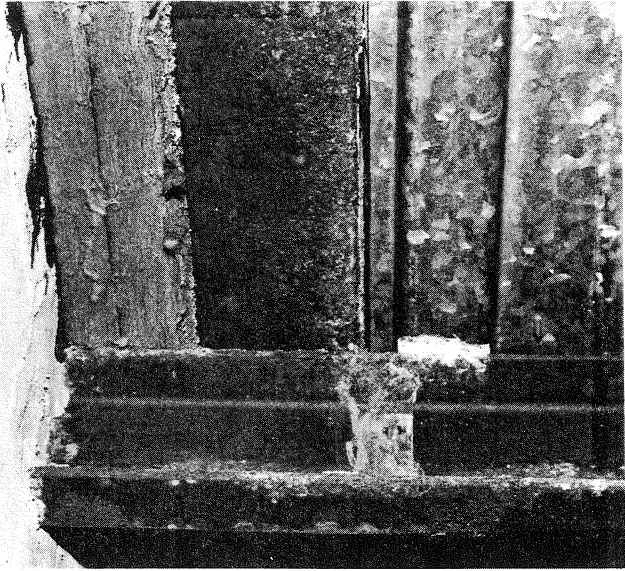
Wall/Lower Roof Intersection Showing Lack of Air Seal at Junction
